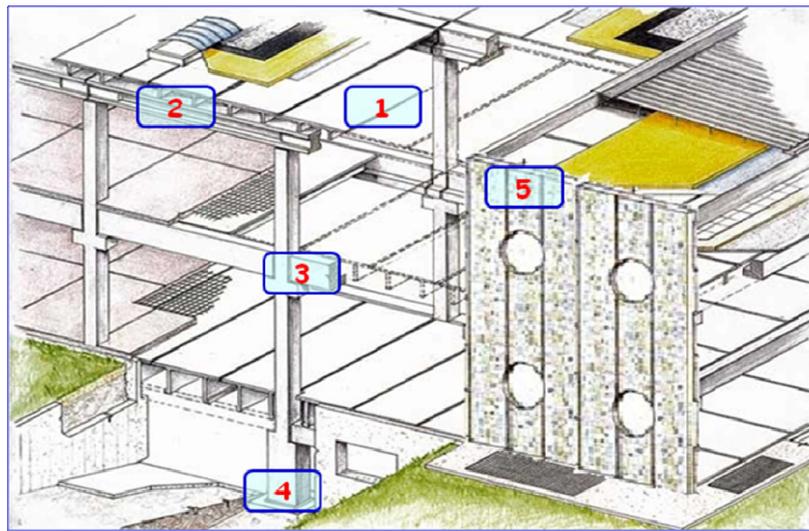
Categories of connections between the different structural elements of a precast concrete building.
